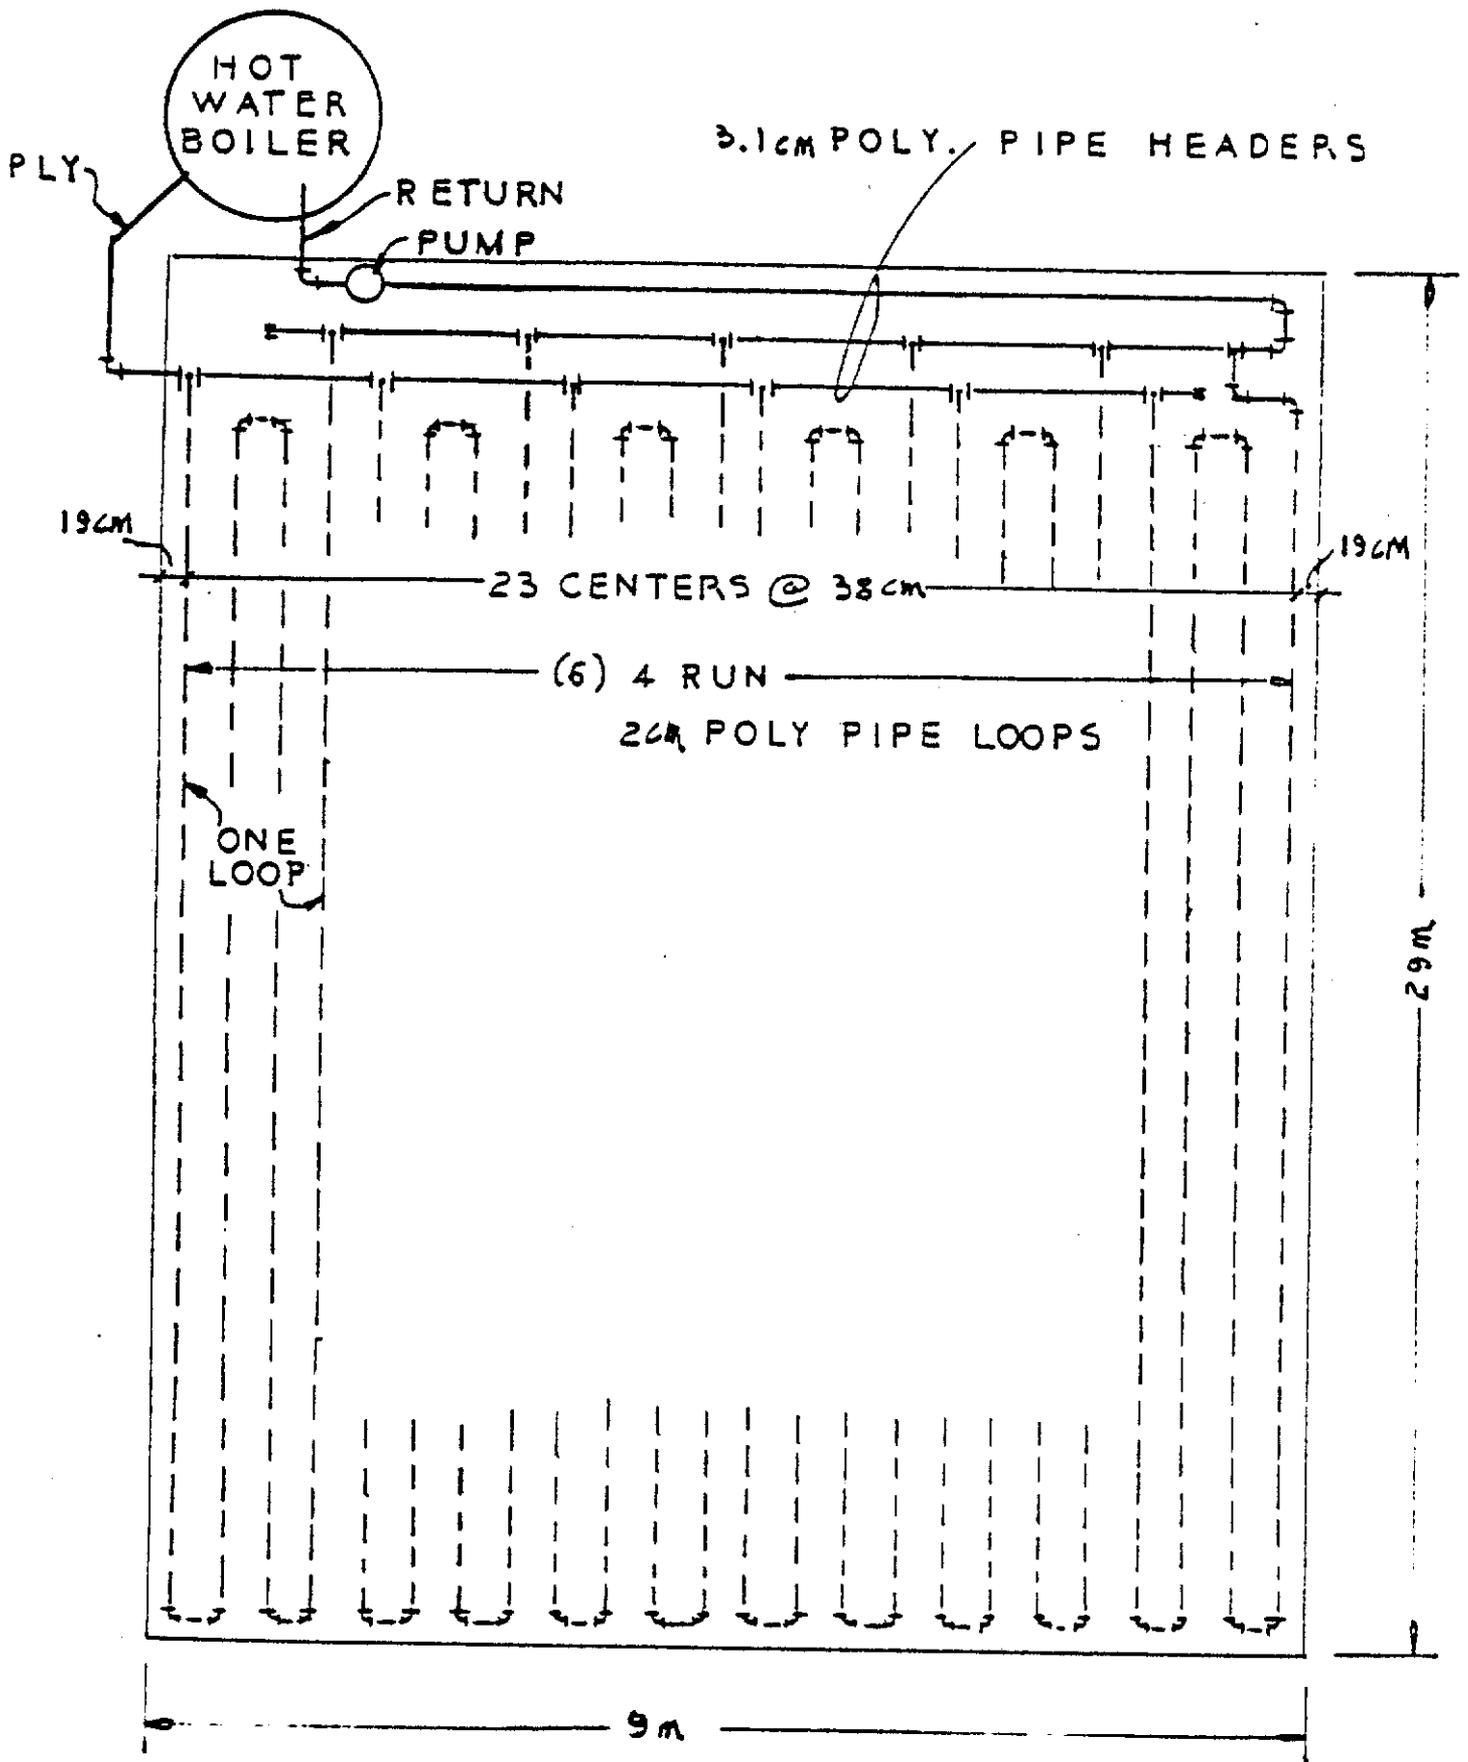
FLOOR HEAT PIPE LOOP LAYOUT
